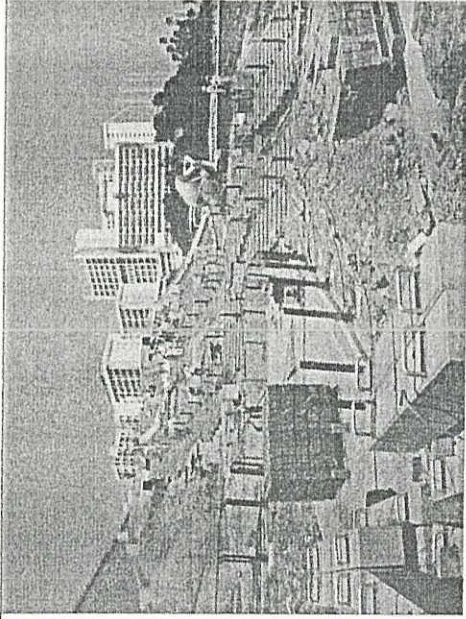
Ongoing landscaping works at the Northern end of MEF Station.
